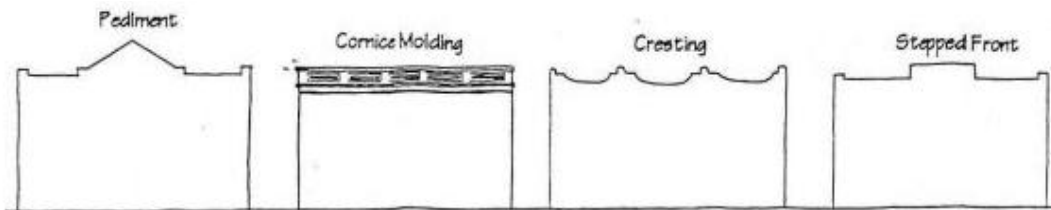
(E)(2). Acceptable roof forms for commercial buildings.
